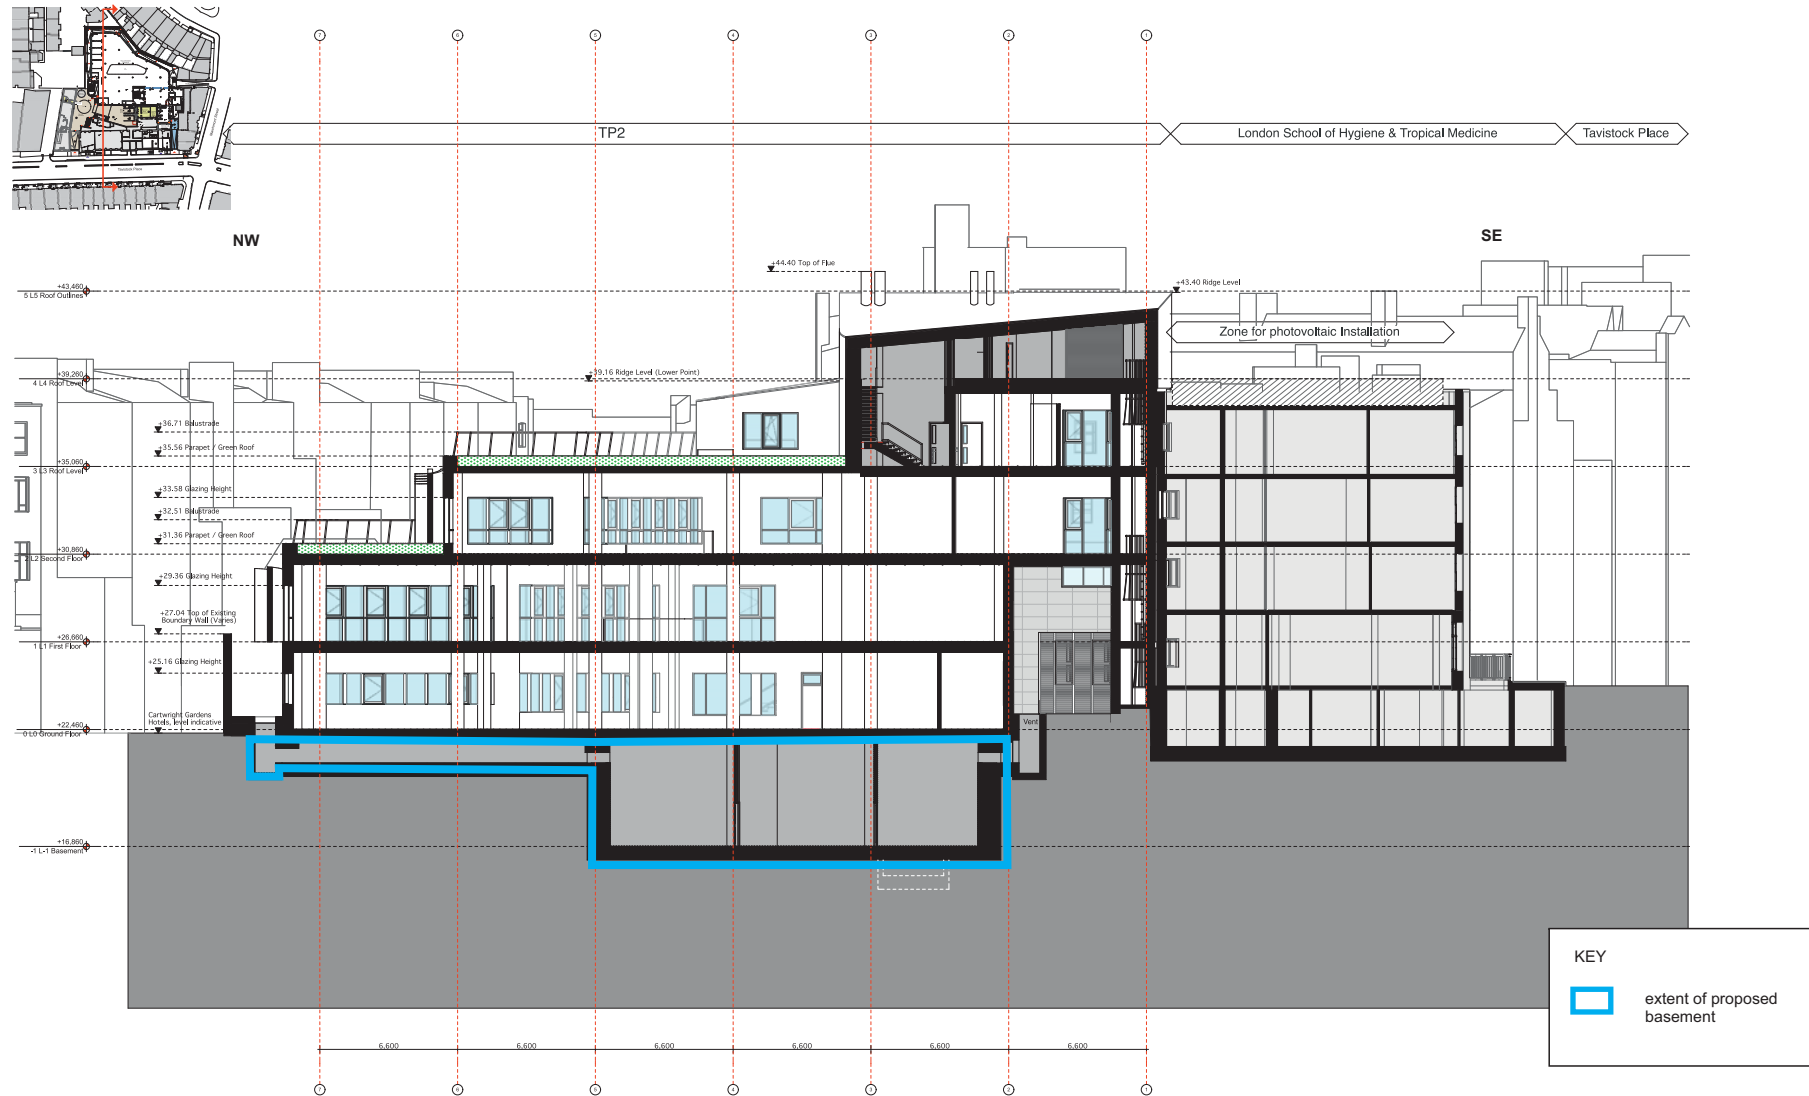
Proposed south-west facing section (BMJ Architects, Drwg No 2924/AW10 PL(00)30, October 2017, Rev E)
